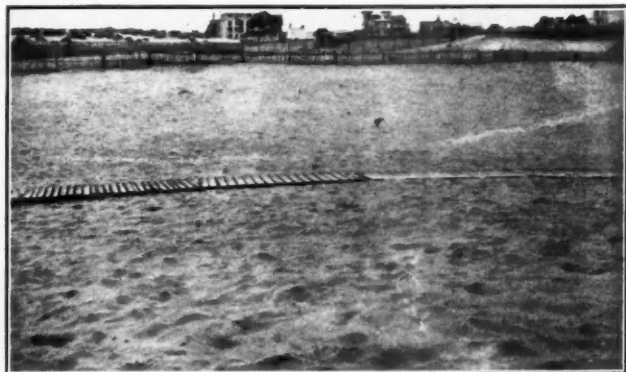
Paris Plage. Fencing sand-traps on dry beaches
